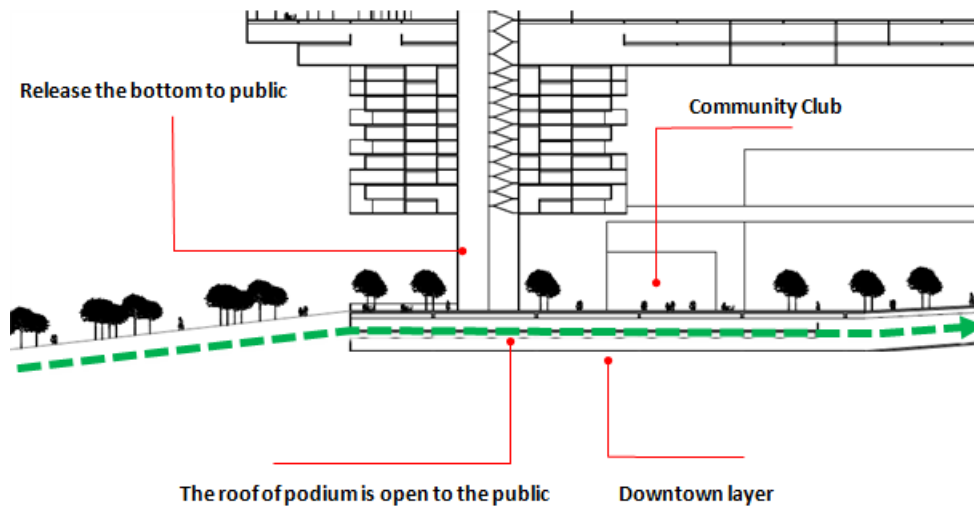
The intersection between the towers and roof garden. The architect would release the bottom of towers for public activity.
